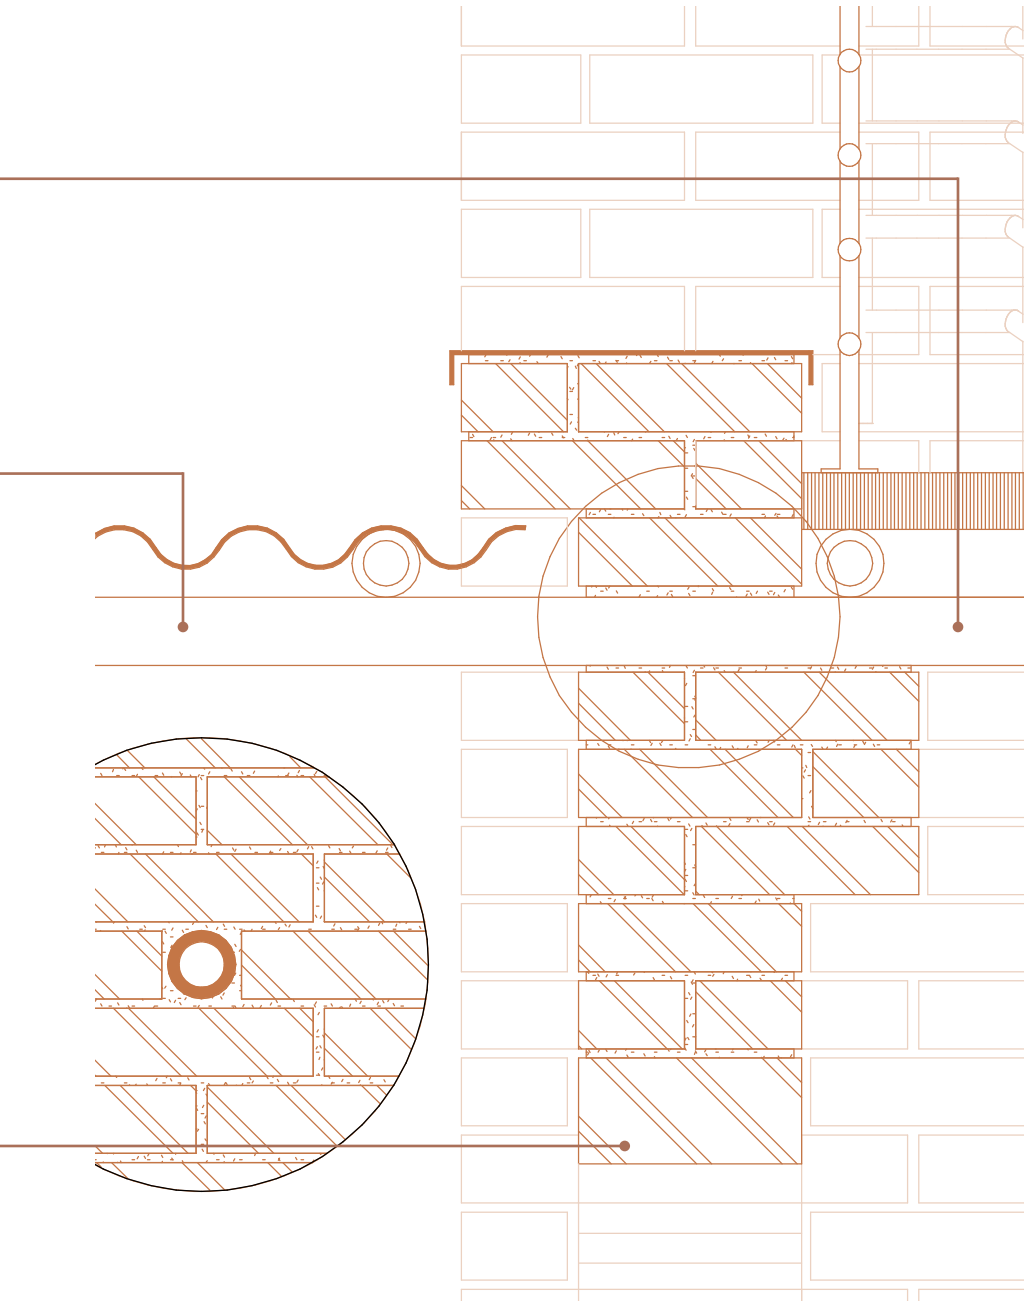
Detail Exception in Building Structure [Scale 1:10]
